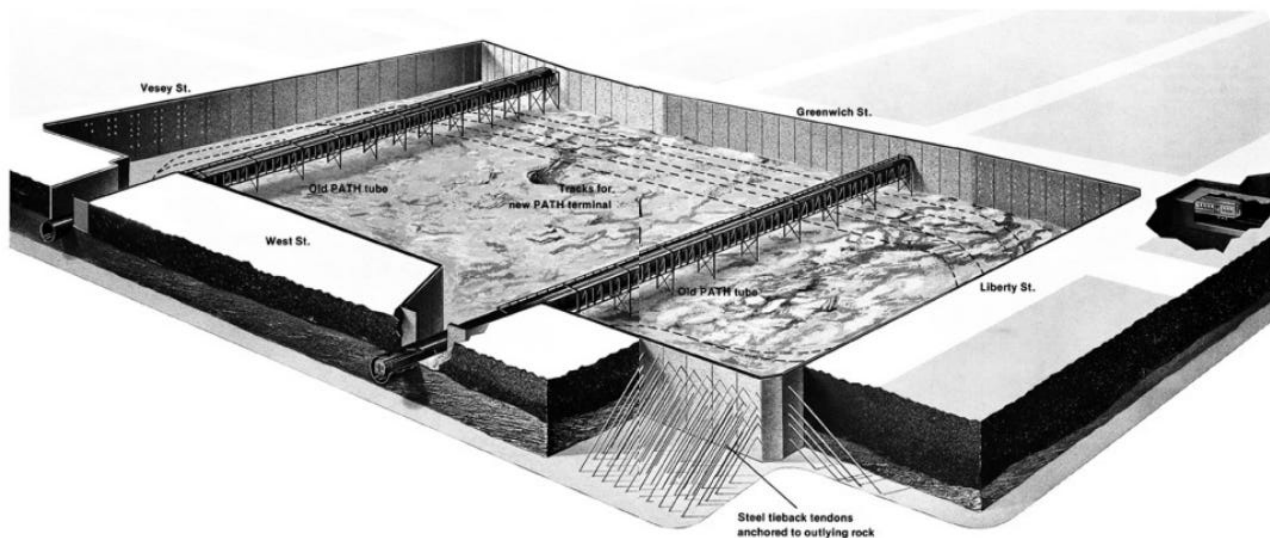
Diagrams of the inverted Bathtub foundation site and excavation methodology for the original World Trade Center. Source: <https://www.construction-physics.com/p/building-fast-and-slow-part-iii-design>
